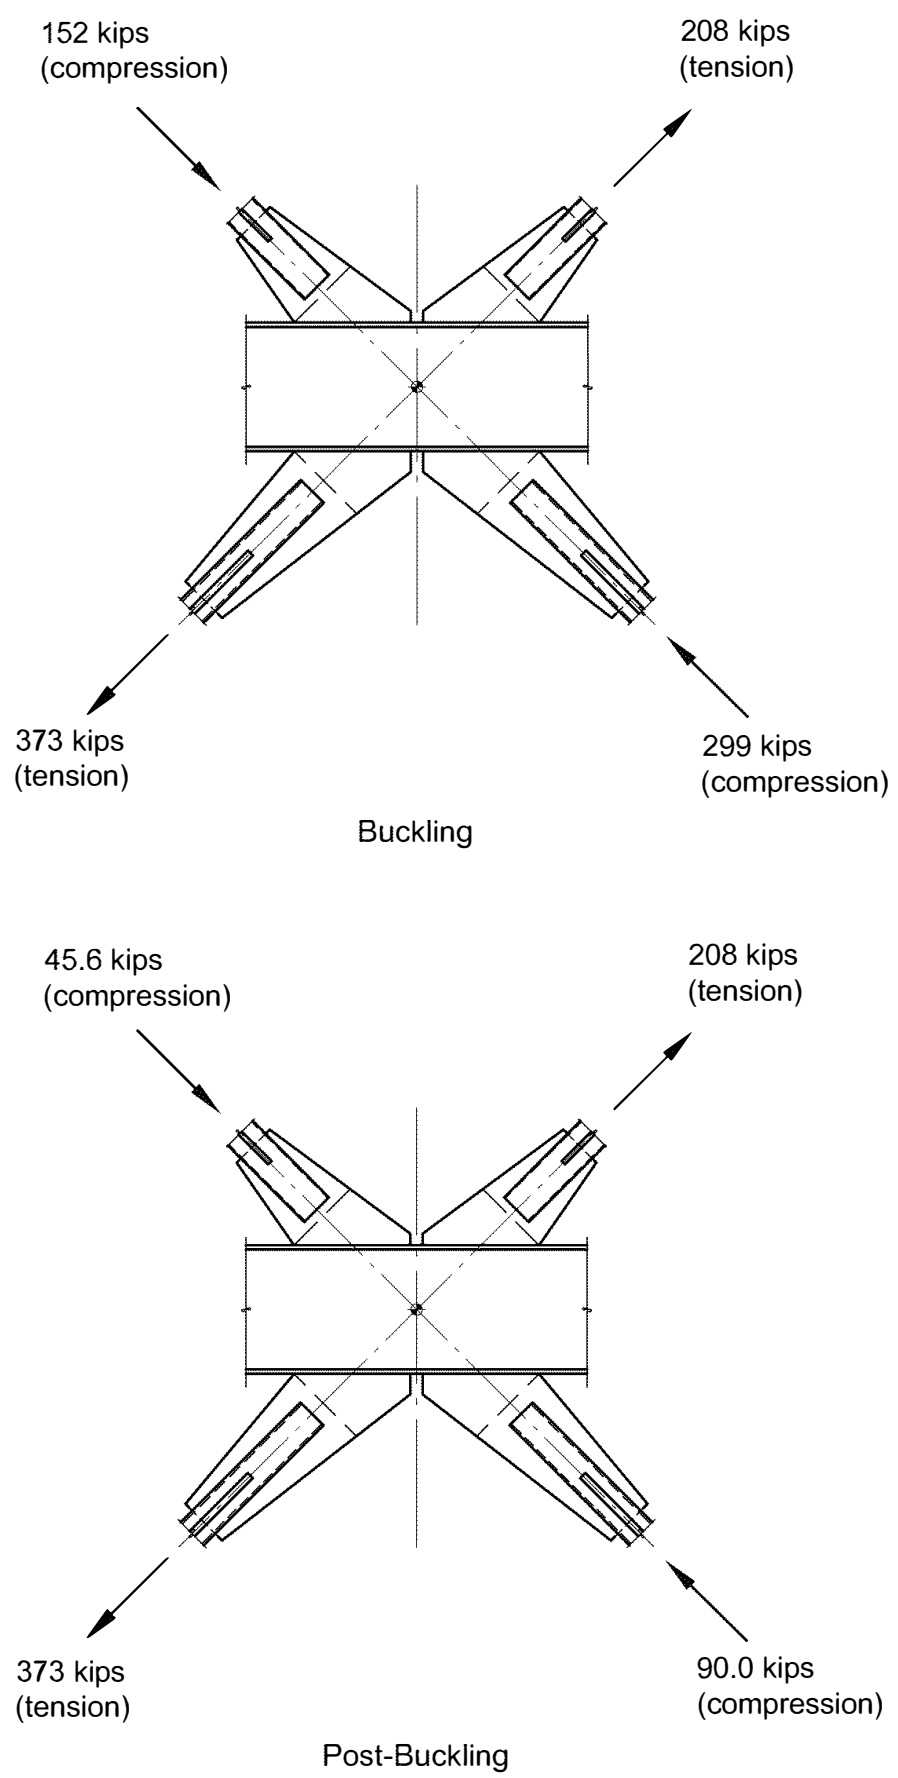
Required strength of brace connections according to AISC Seismic Provisions Sections F2.3(a) and F2.3(b)—ASD.
